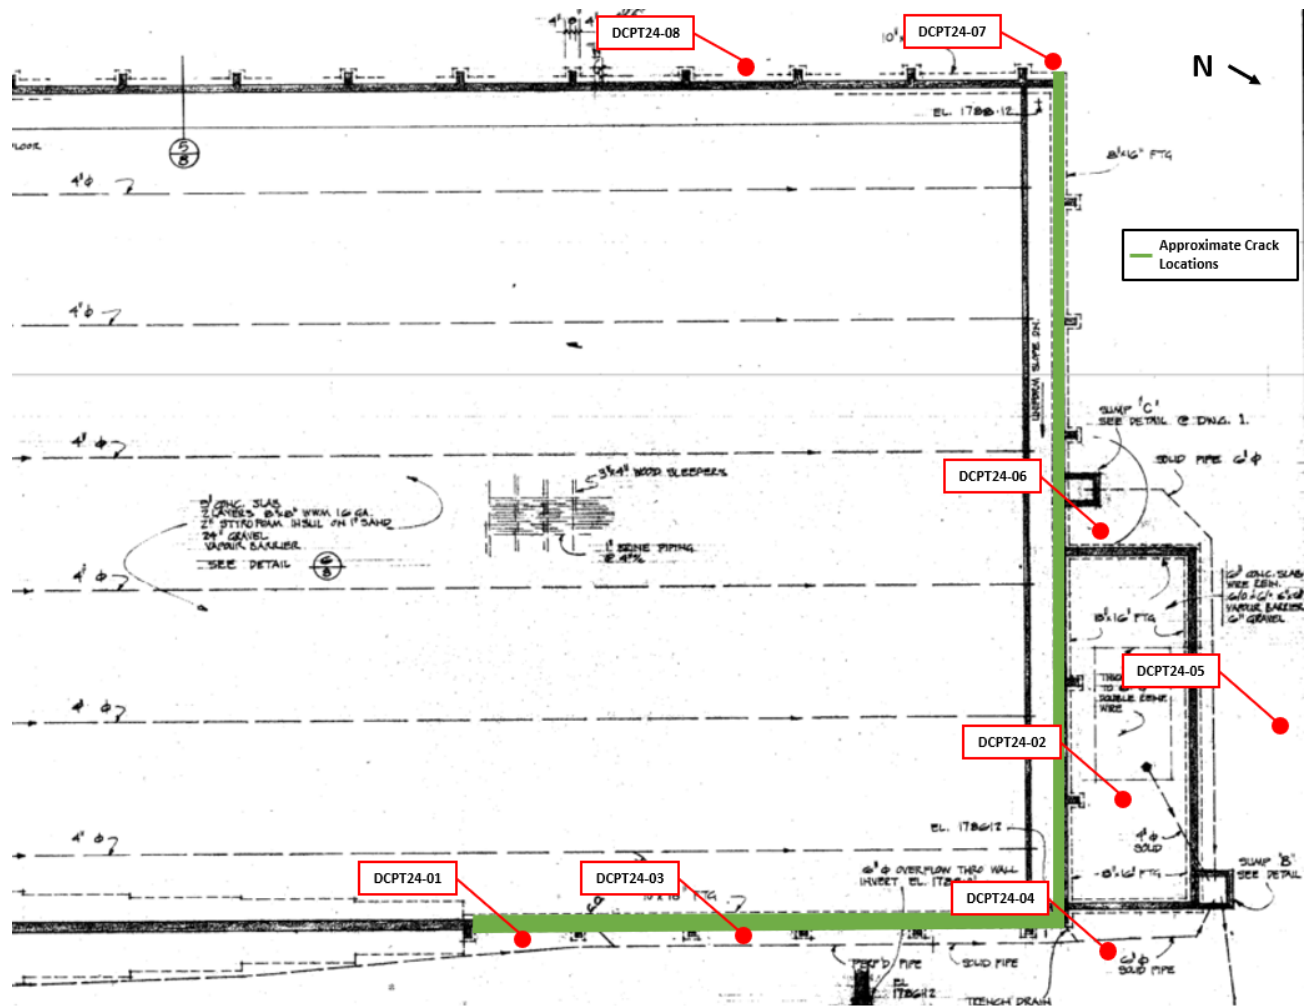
Approximate DCP Test Hole and Crack Locations (excerpt from DWG 2 – Foundation Plan & Details)
